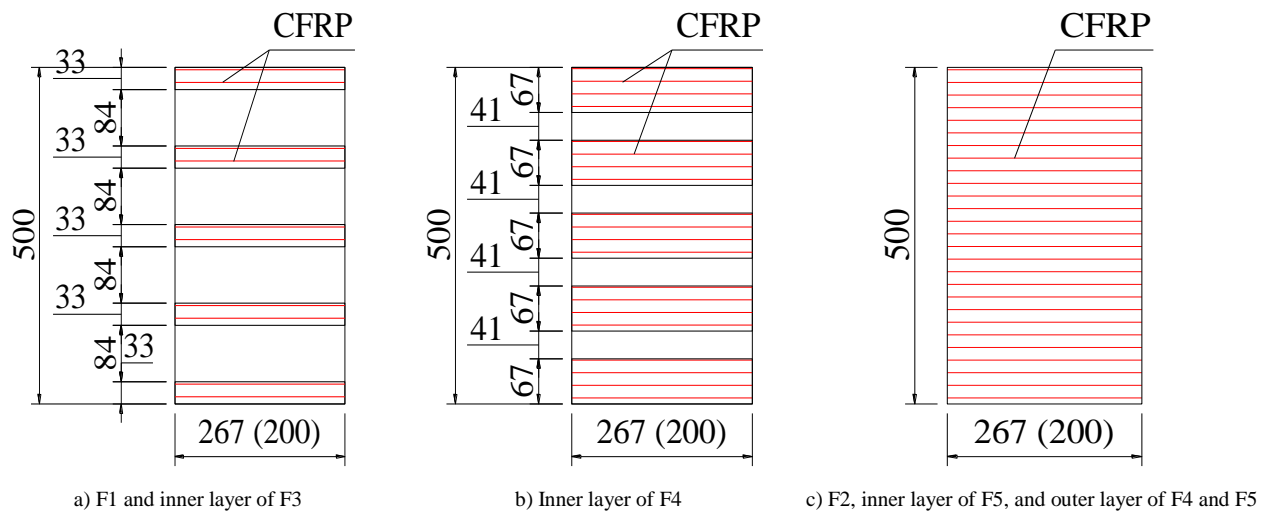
CFRP retrofitting configurations for the tested columns (unit: mm)
